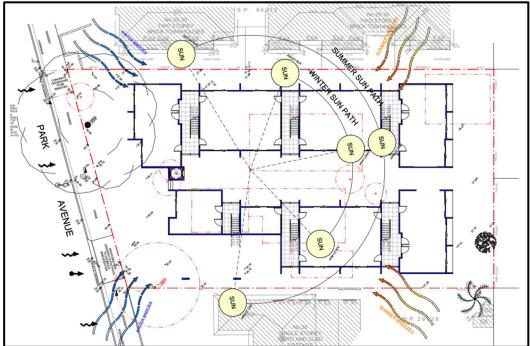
Extract of site analysis plan showing tree retention in front yard, staggered building front setback, building separation to neighbouring properties and sun light paths across the site
